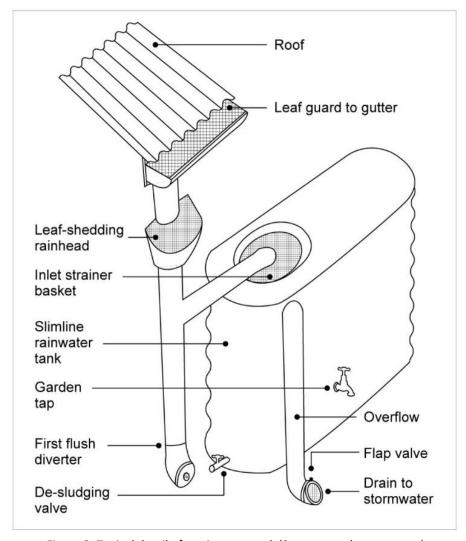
Typical detail of a rainwater tank (Source: yourhome.gov.au)
